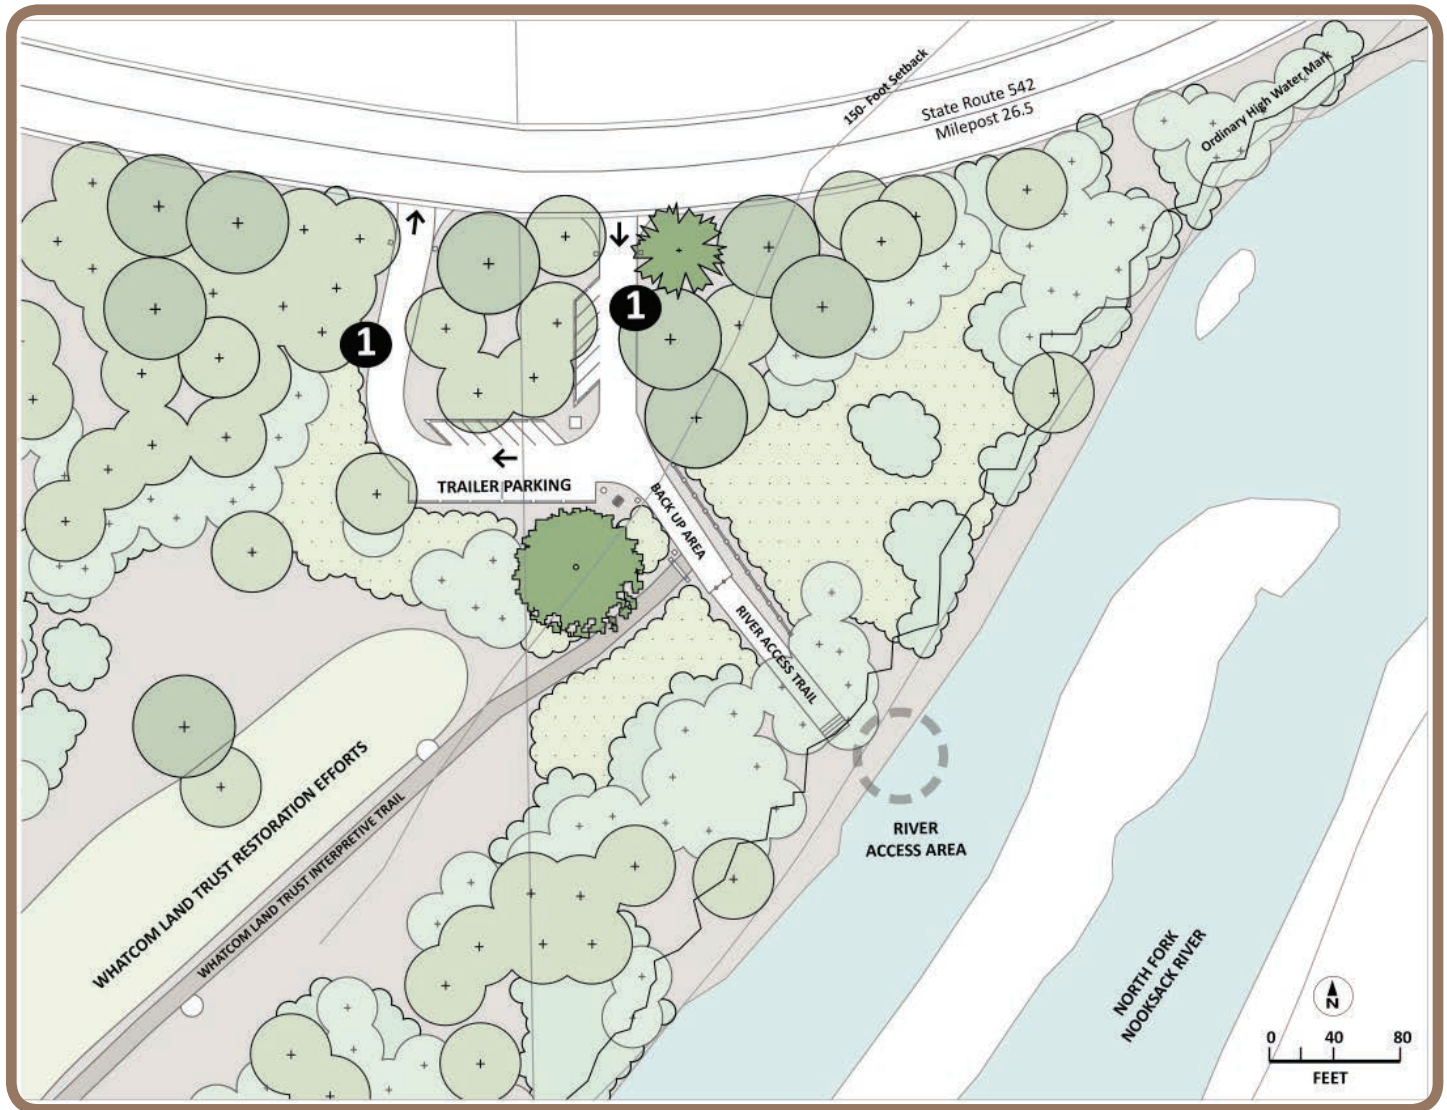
Public access to the site including parking vehicular circulation, parking, and trailer back-up areas. Credit: Brianna Truden.
